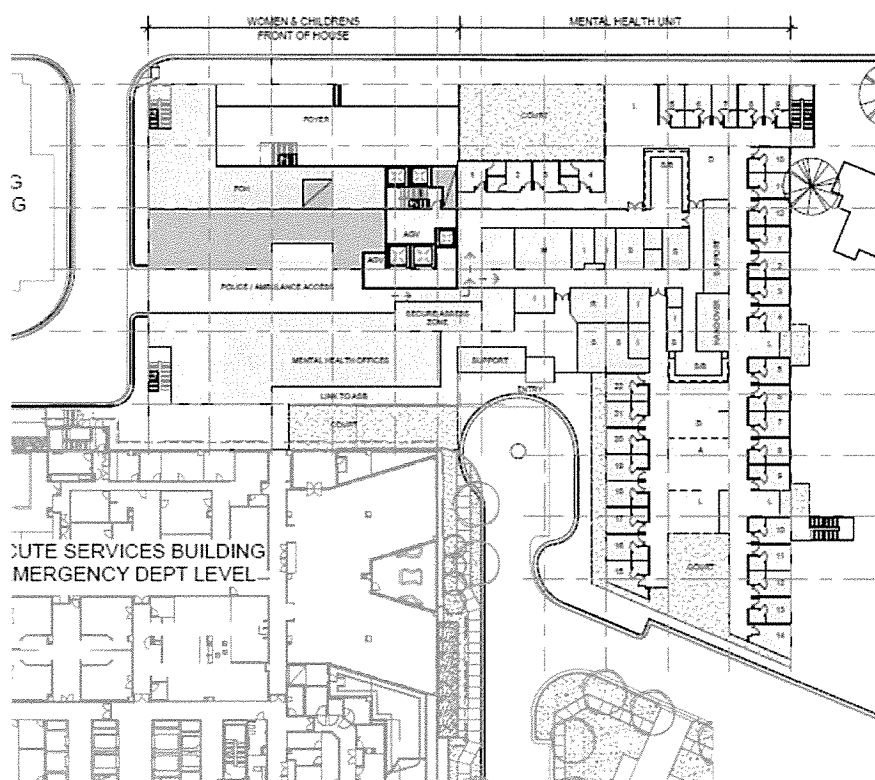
Concept Plan level 2. (Source: Hassell)
